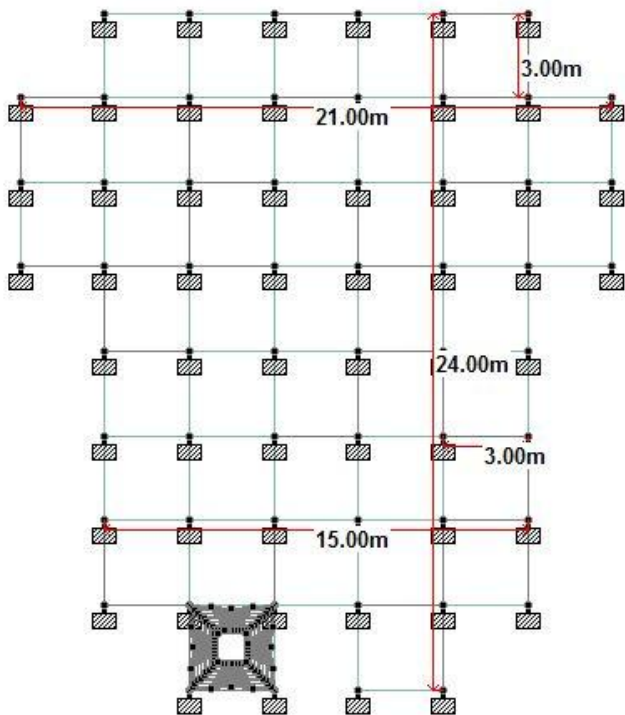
Case C of Telecommunication Tower over Roof (Plan-Position P3)
